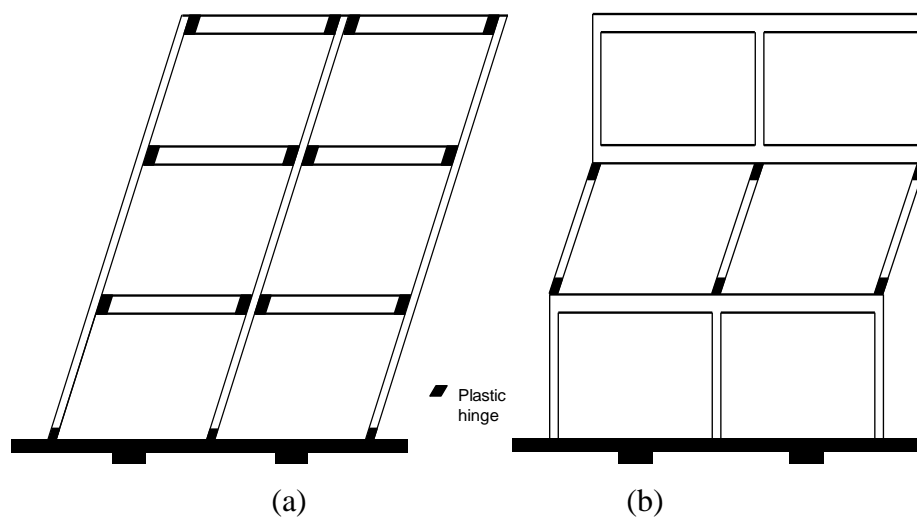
Structural failure types: (a) beam-sway mechanism; and (b) soft story mechanism
